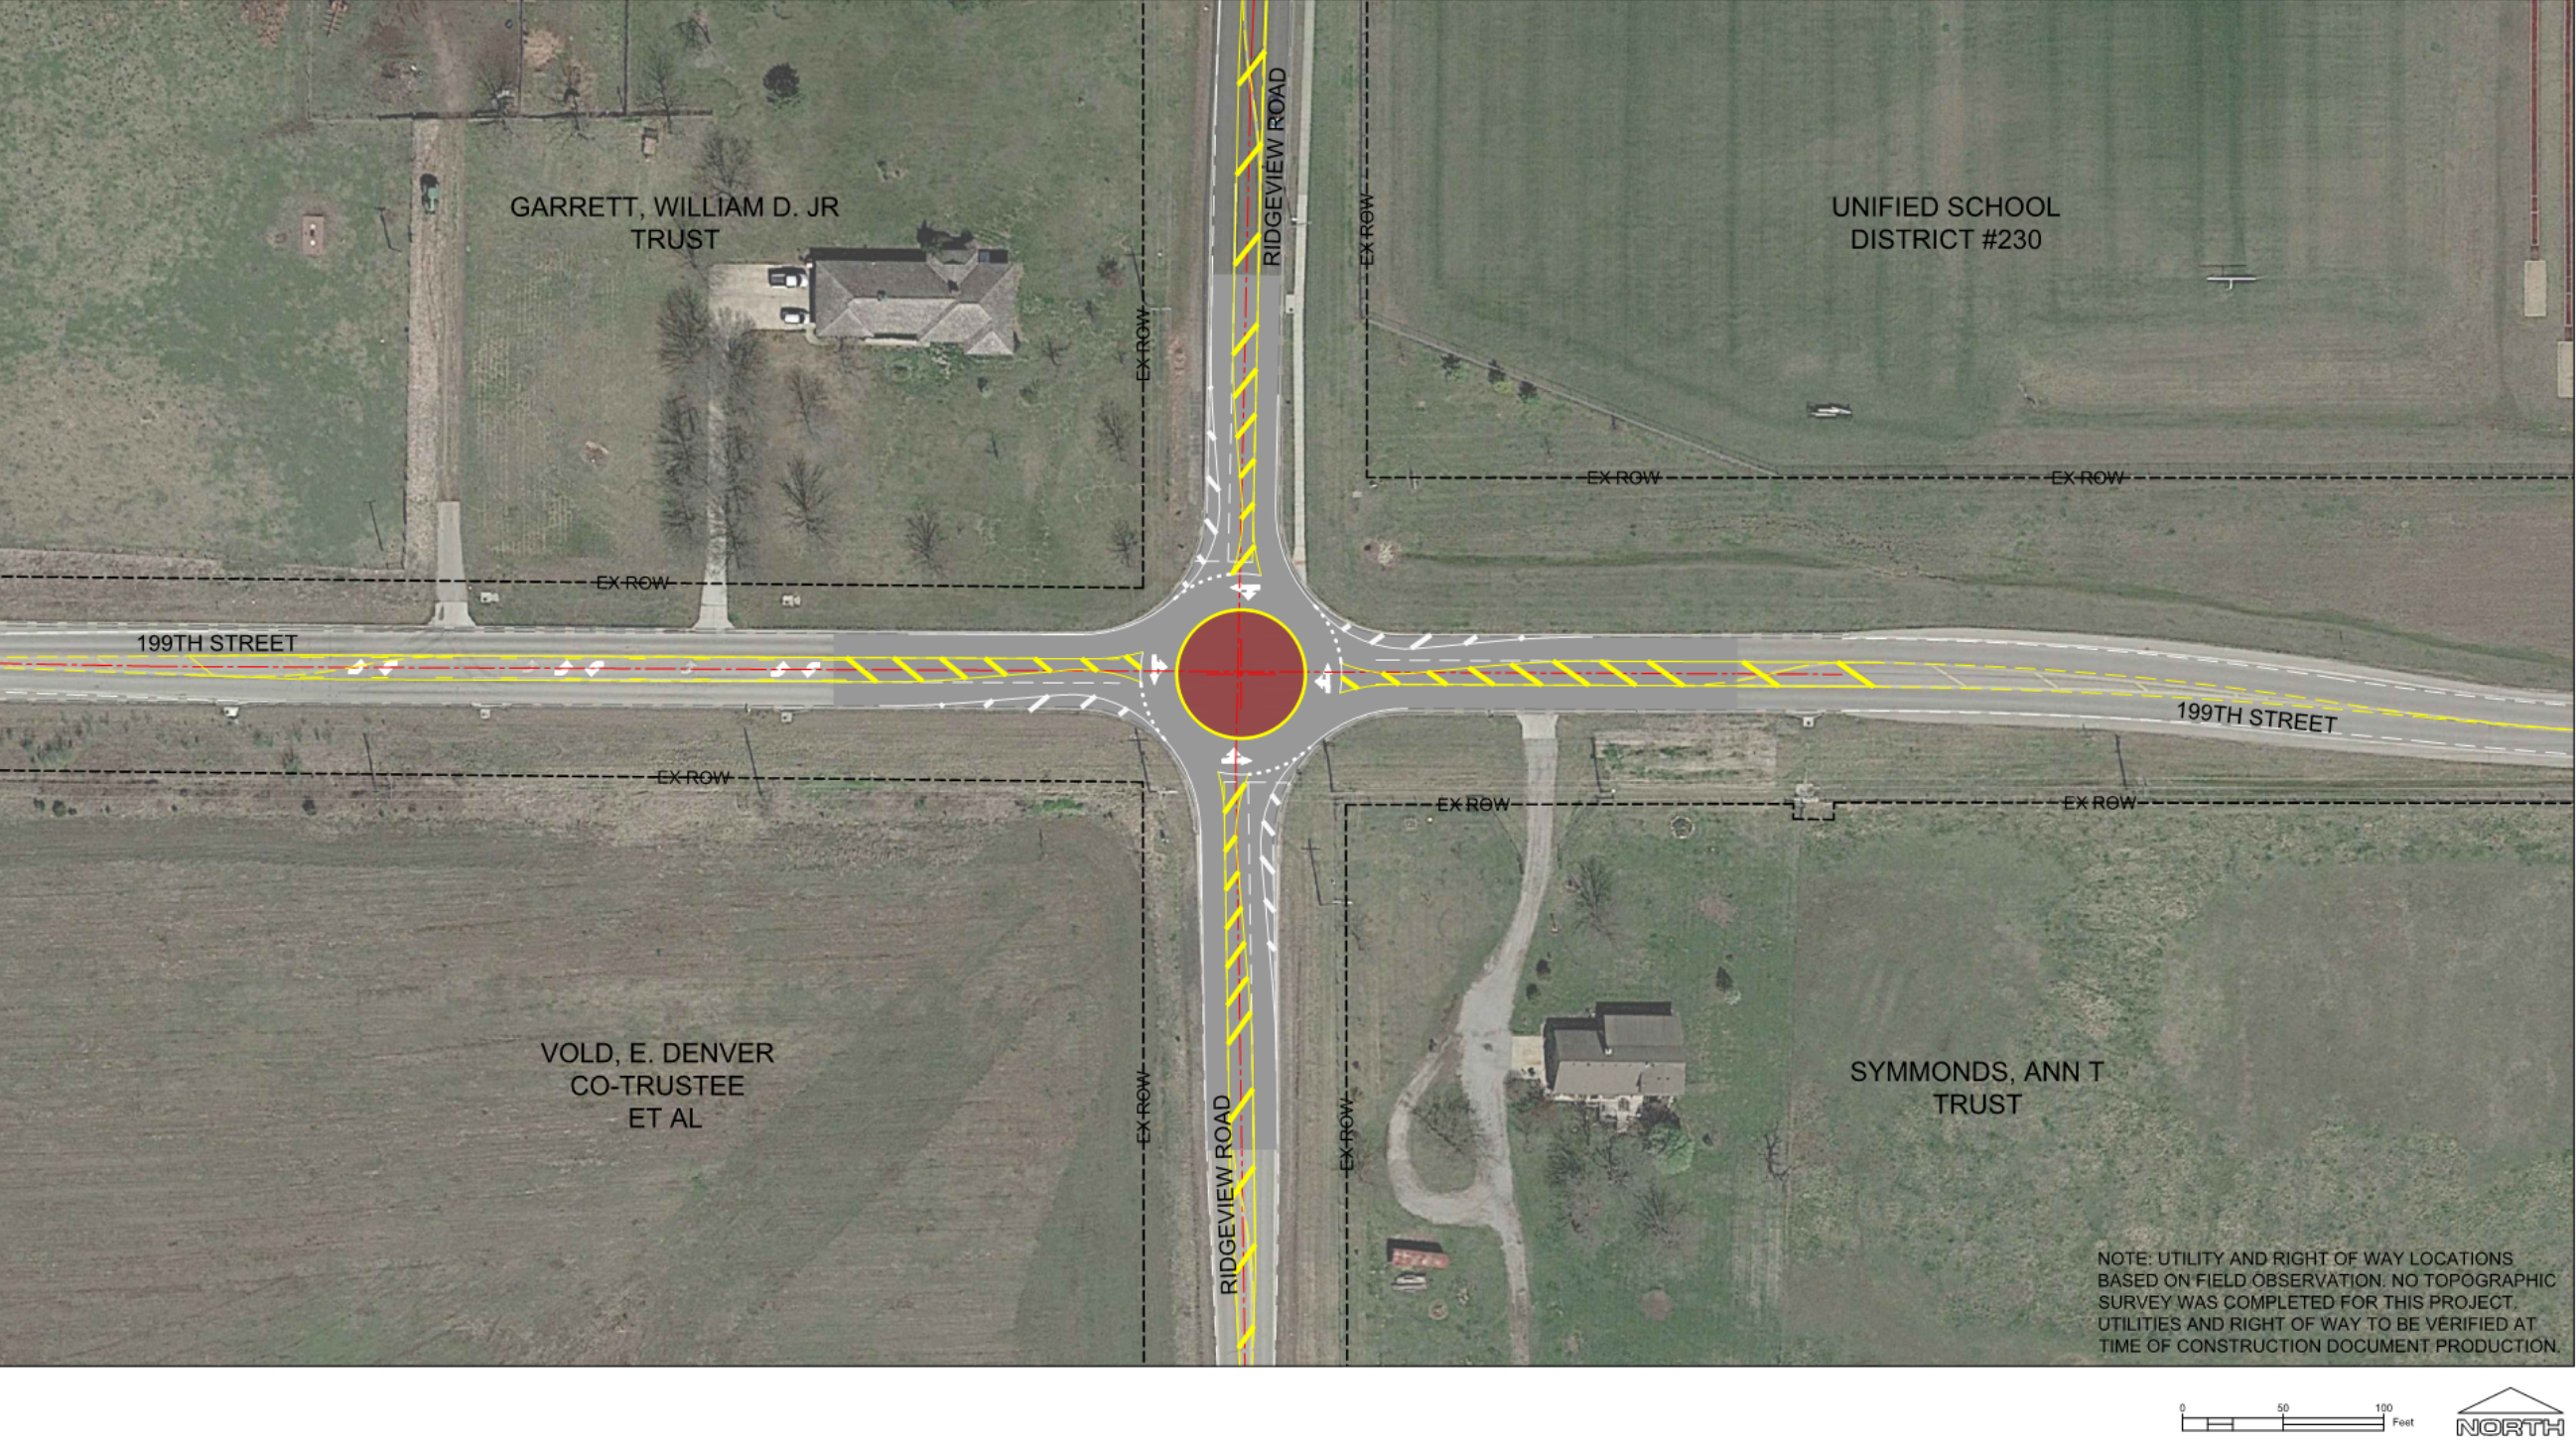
Design Concept Sketch for Accelerated Low-Cost Roundabout - 199th Street & Ridgeview Road
